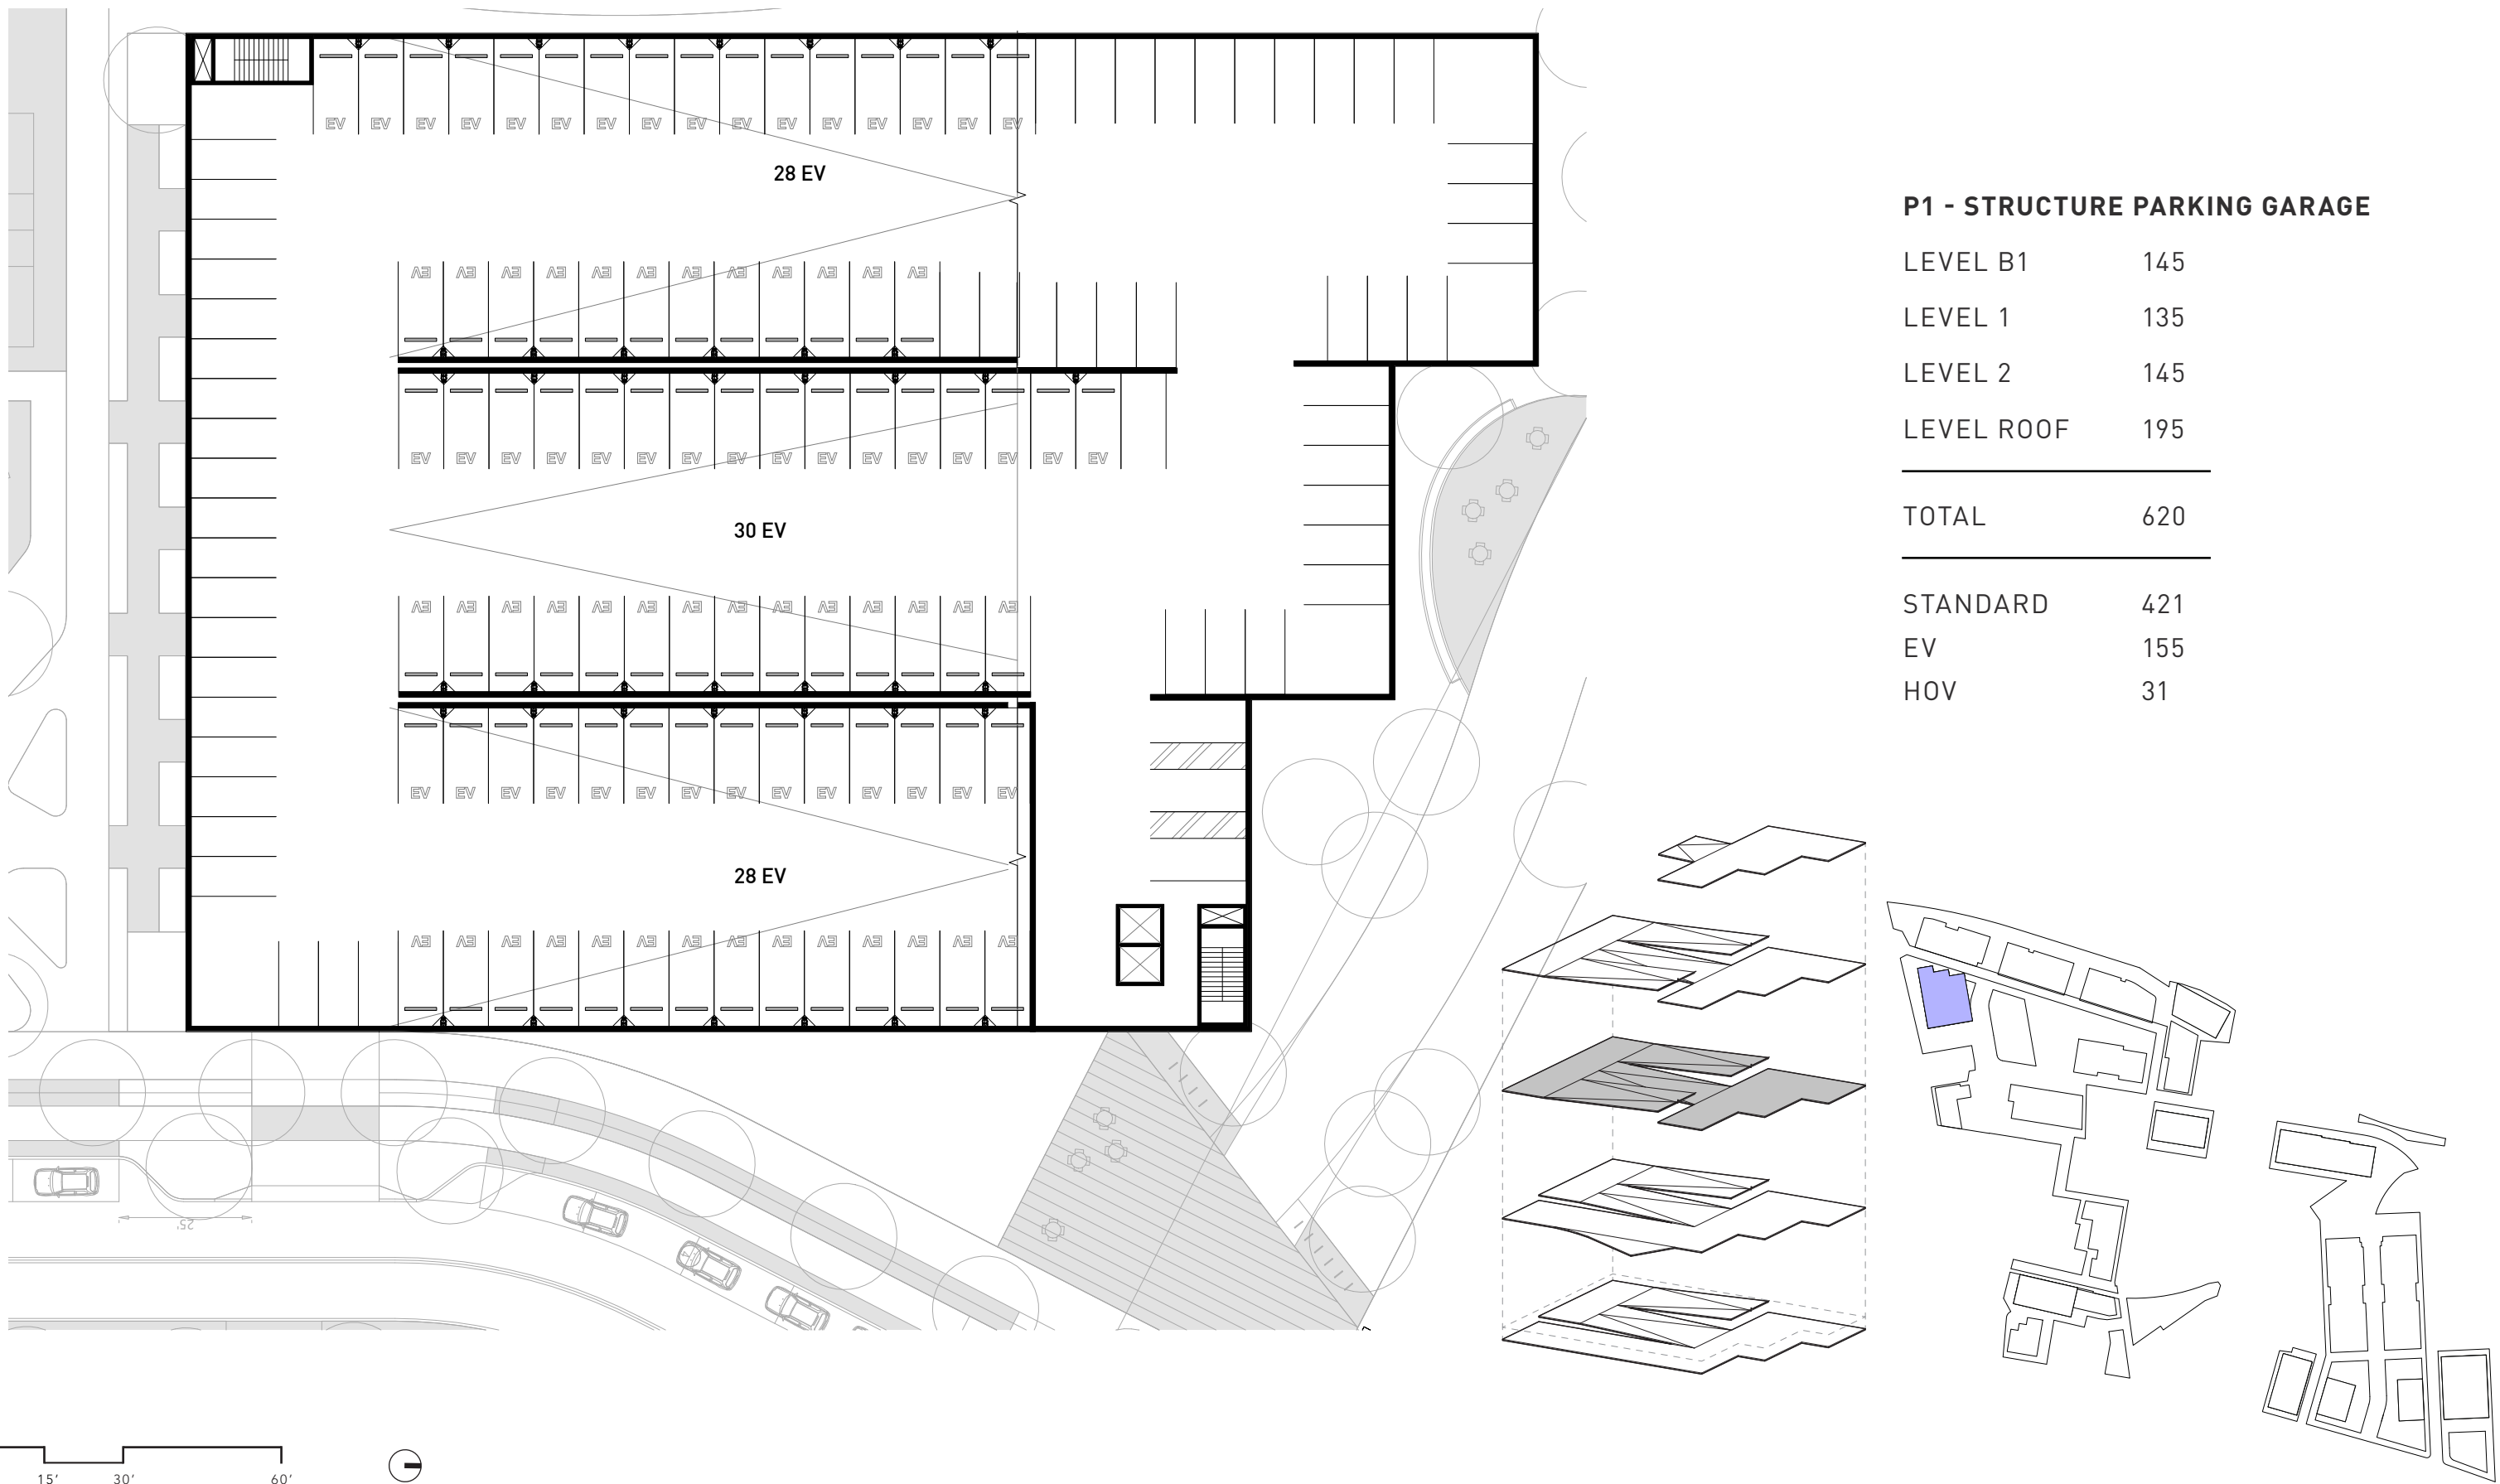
Proposed Vehicle Parking Plans - P1 Level Roof
